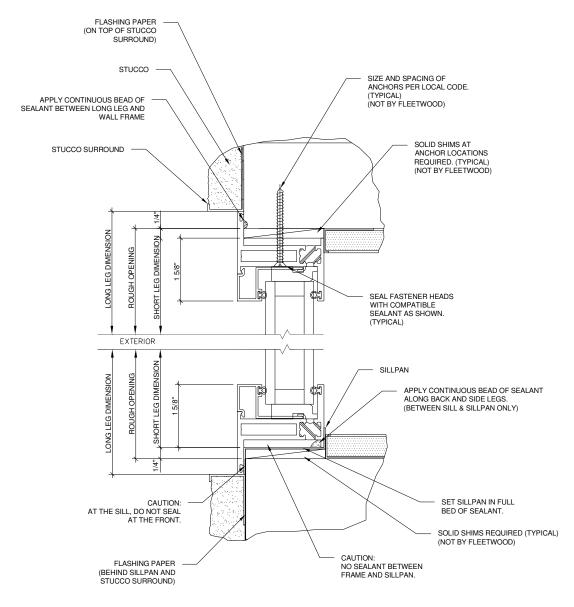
Uneven Leg Frame Window Installation (Fixed Shown, Same for Casement / Awning)
